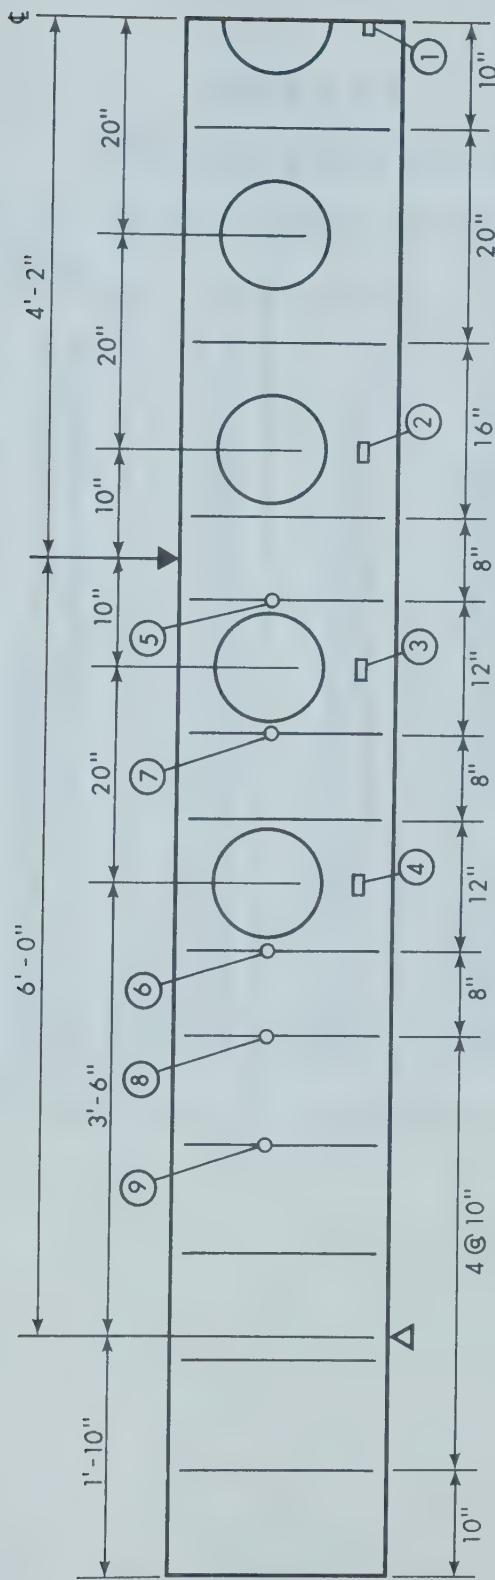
BEAM AD-2 REINFORCEMENT AND GAUGE DETAILS
